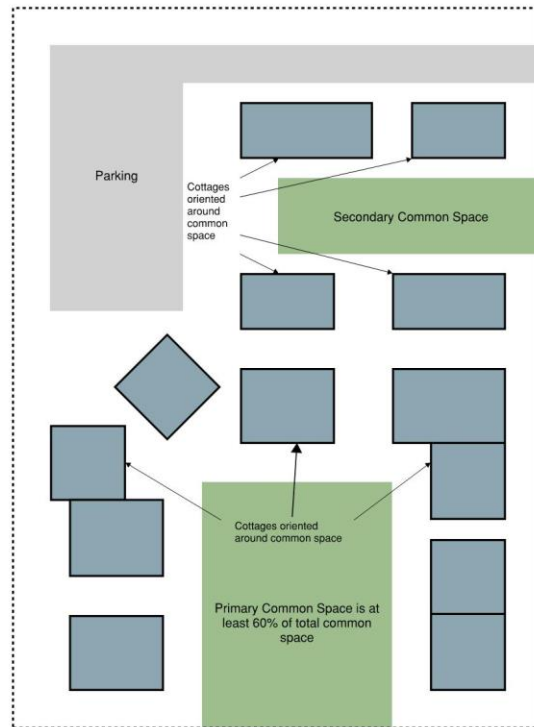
(H)(4)(c): Cottage Open Space Sample Layout
